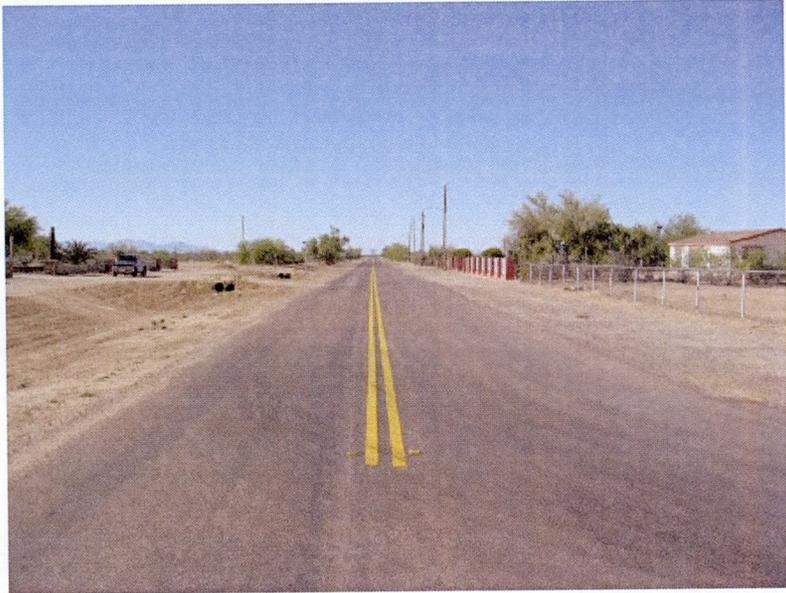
At the intersection of Citrus Road and Audry Lane looking south at Citrus Road.
